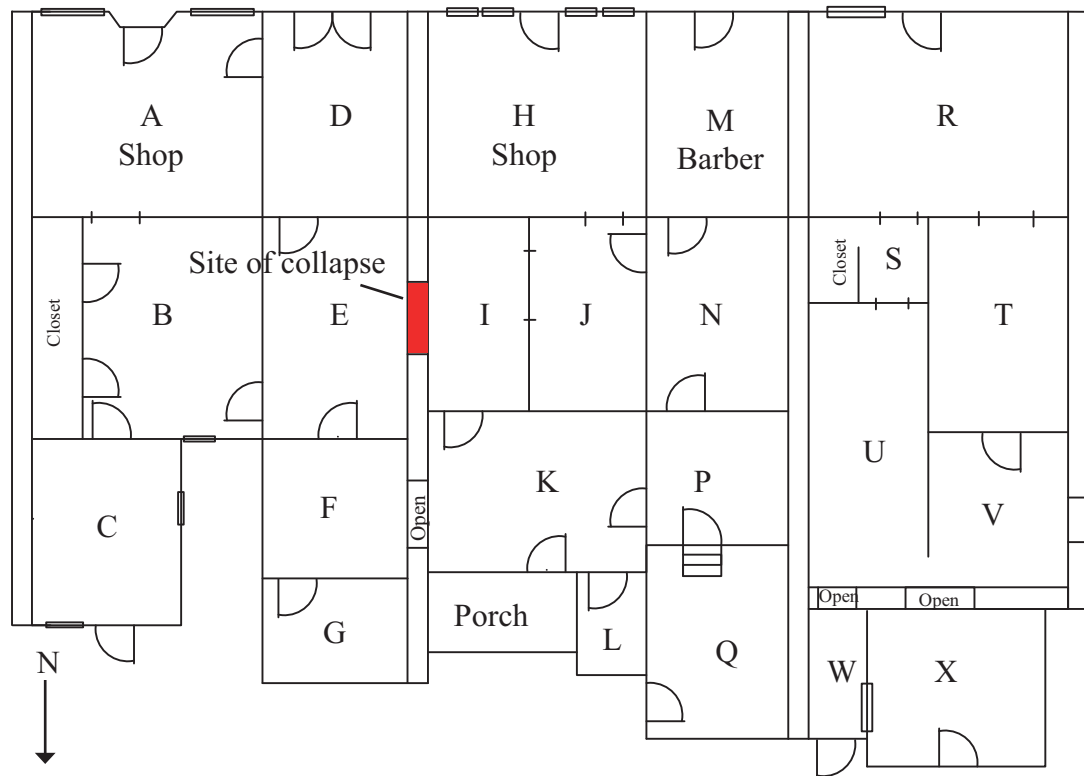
Floorplan of Kraemer and McGovern Buildings. The Kraemer Building consists of Rooms R through X, on the right third of the plan. The McGovern Building is the remaining portion. Load-bearing log wall are denoted by double-thickness lines, and frame walls are denoted by single-thickness lines. Drawing not to scale.
